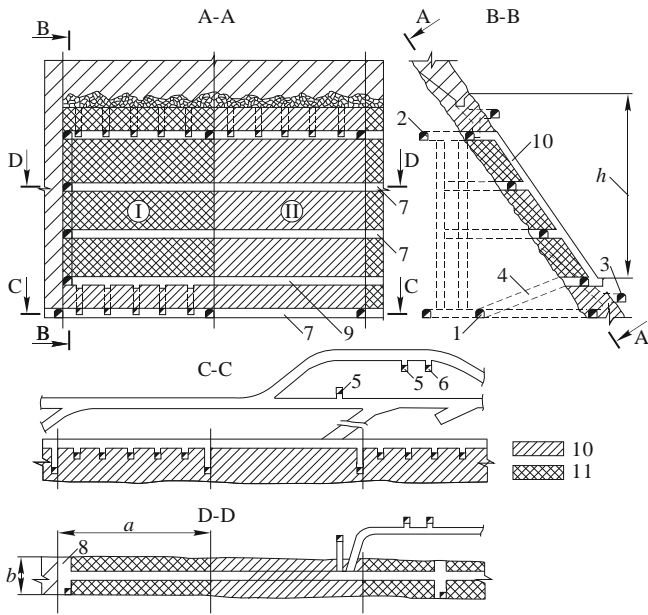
Sublevel stoping mining system with backfilling the mined-out area using cemented mixture; development workings: I – primary stopes; II – secondary stopes; a, b, h – length, width and height of the stopes; 1 – haulage drift; 2 – vent drift; 3 – collector; 4 – ramp; 5 – up-raise block; 6 – ore pass; temporary working: 7 – sublevel drift; 8 – face cut; 9 – undercut drift; 10 – cut-out raise; 11 – reserves prepared for mining; 11 – reserves ready for mining
